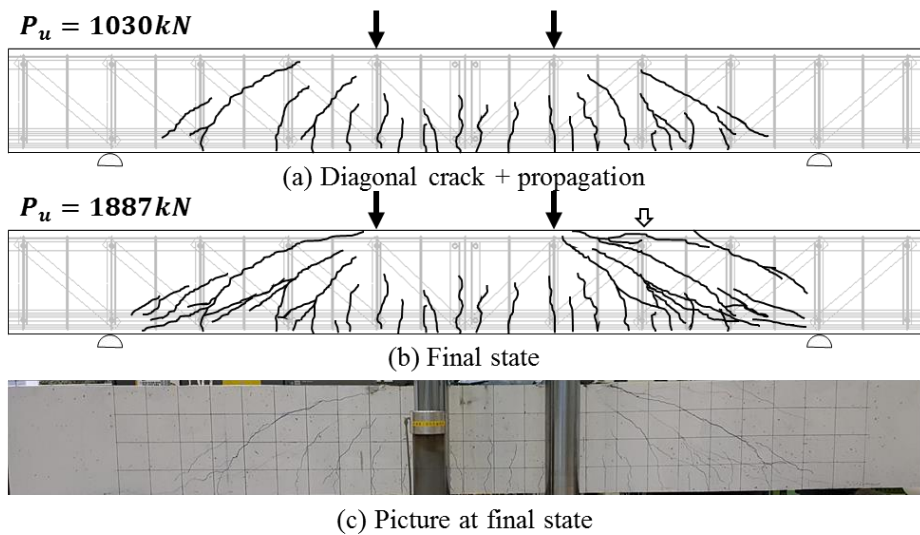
Failure mode and crack pattern of RC-S3 specimen
